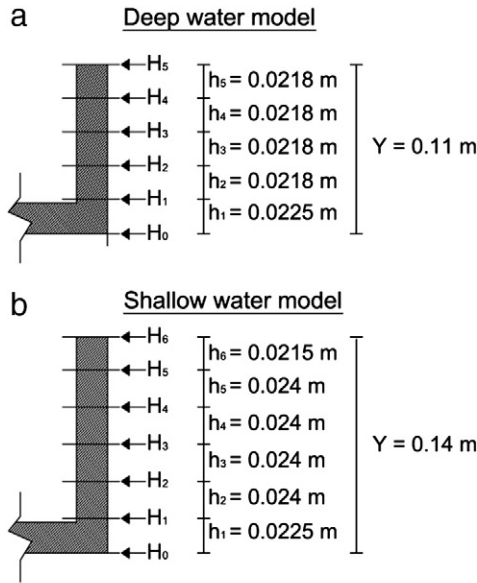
Illustration of horizontal pressures on the crown-wall.
